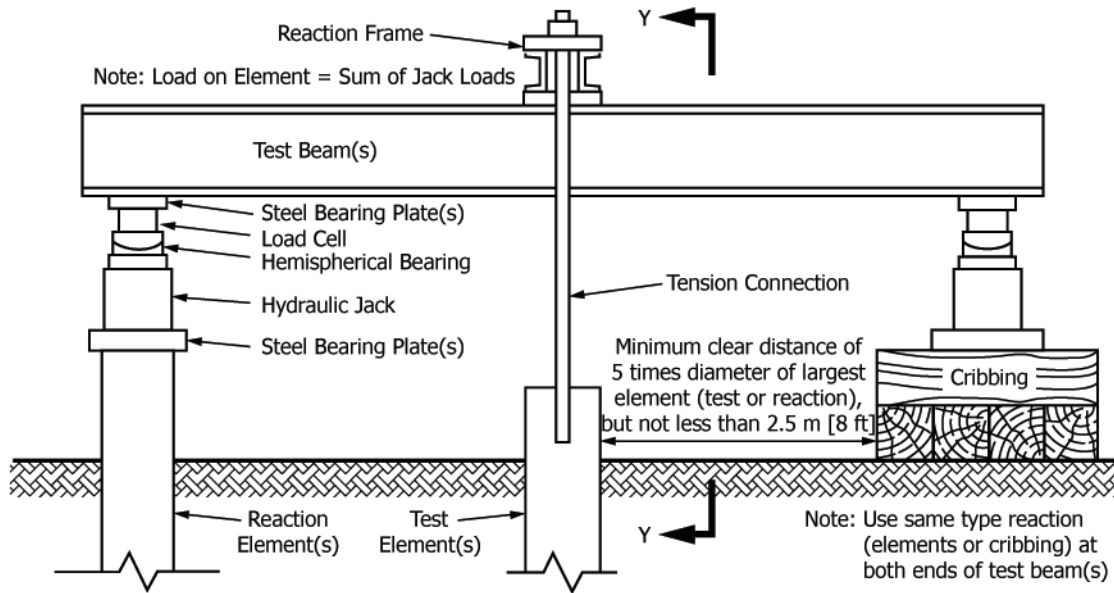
Typical Setup for Tensile-Load Test Using Hydraulic Jacks Acting Upward on Both Ends of Test Beam(s)
